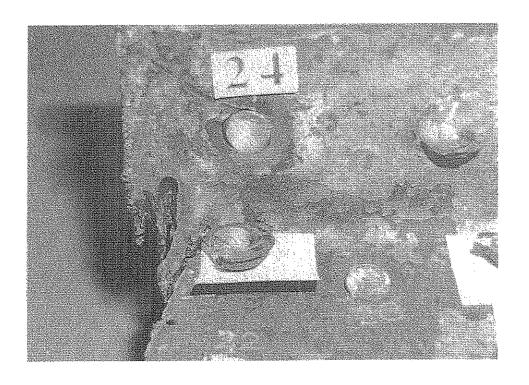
Removed Rivet Heads Next to Their Clean Holes
